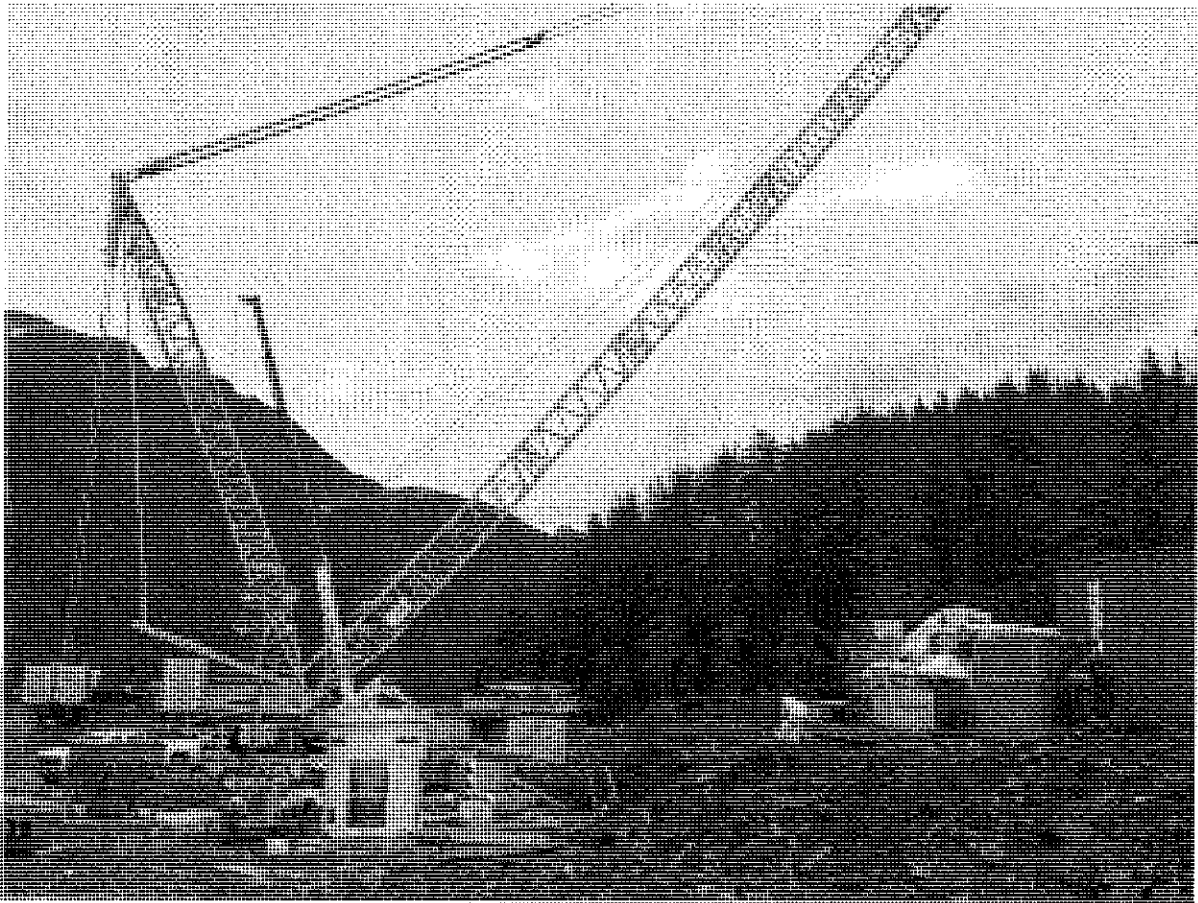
Intake Portal and Right Abutment, Nine blocks are complete on the dam next to the right abutment.
